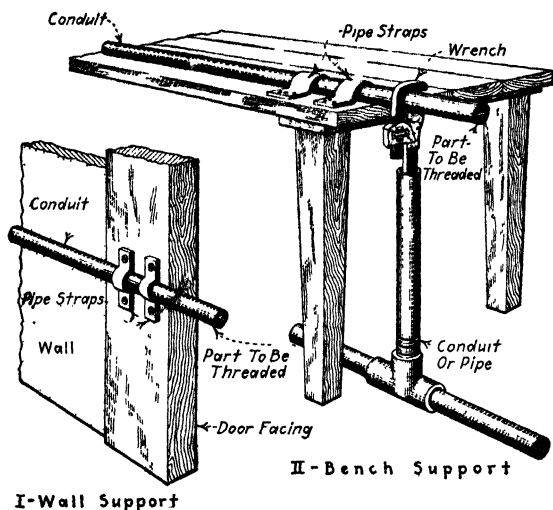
Improved pipe vise for conduit work. A bending hickey may sometimes be used instead of the pipe tee and long nipple, for holding the wrench.
